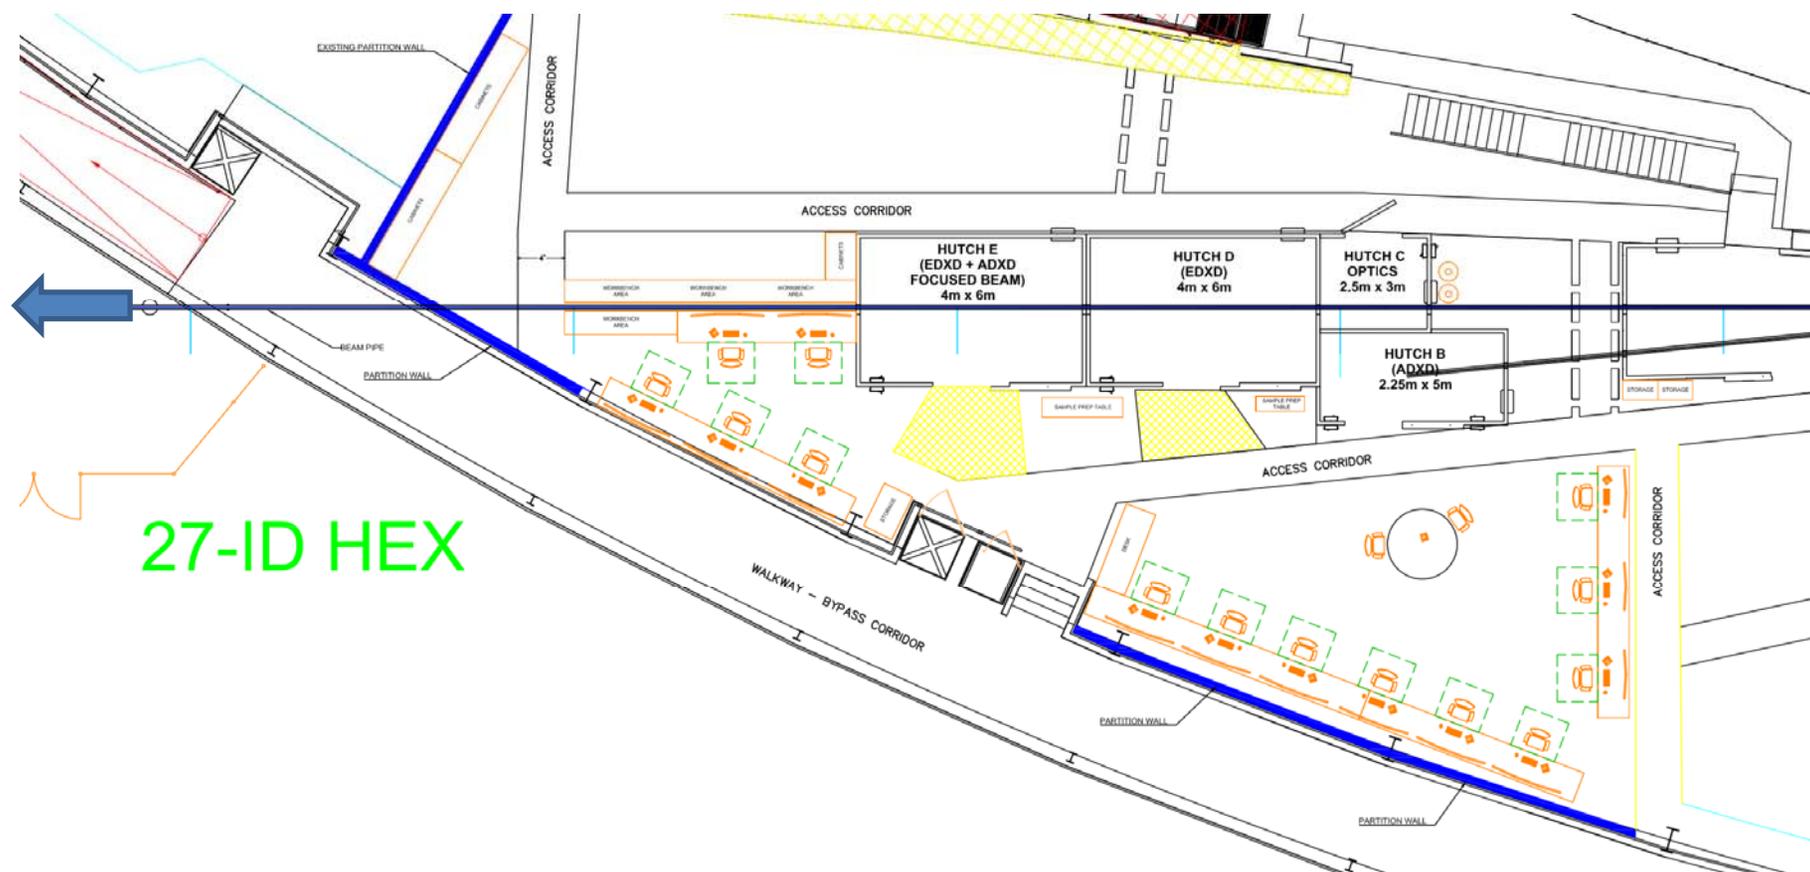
HEX Beamline User Area Layout on the Experimental Floor
